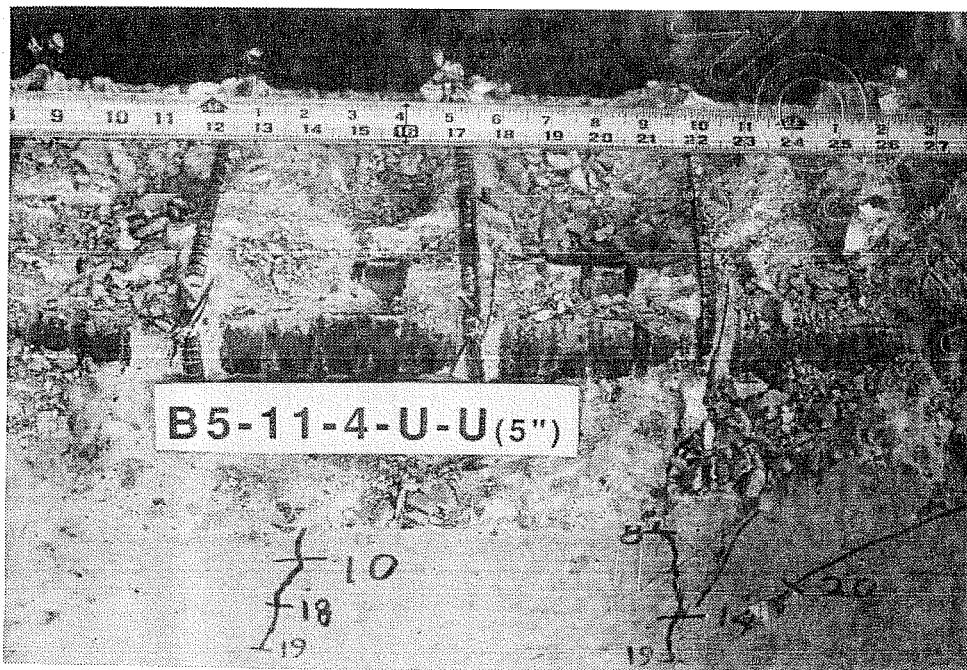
Uncoated reinforcing bars after splice failure.
